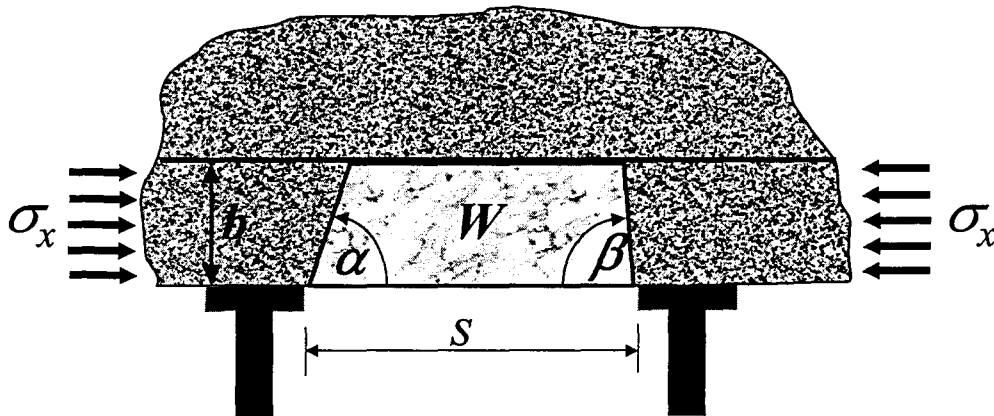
Keyblock instability due to shear failure at the abutments.
